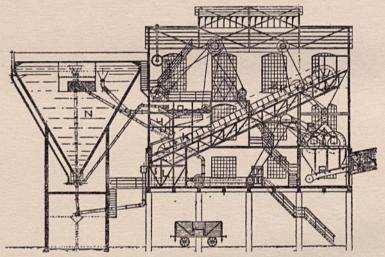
Longitudinal Section of Continuous Washing and Draining Plant. (Institute of Mining Engineers.)
